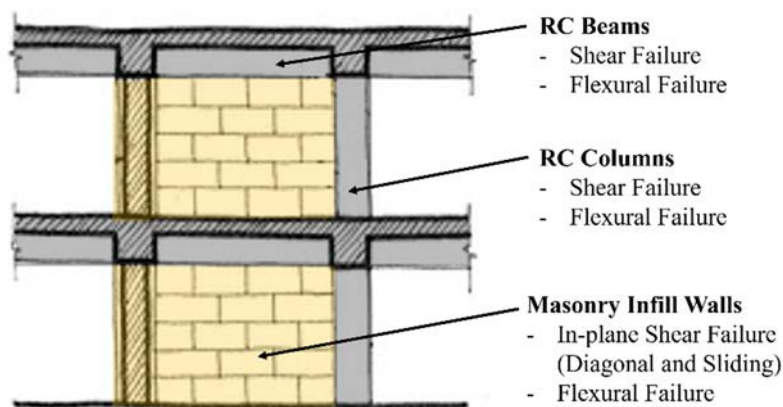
Structural elements and failure modes applicable to low-to-medium rise RC framed buildings.
